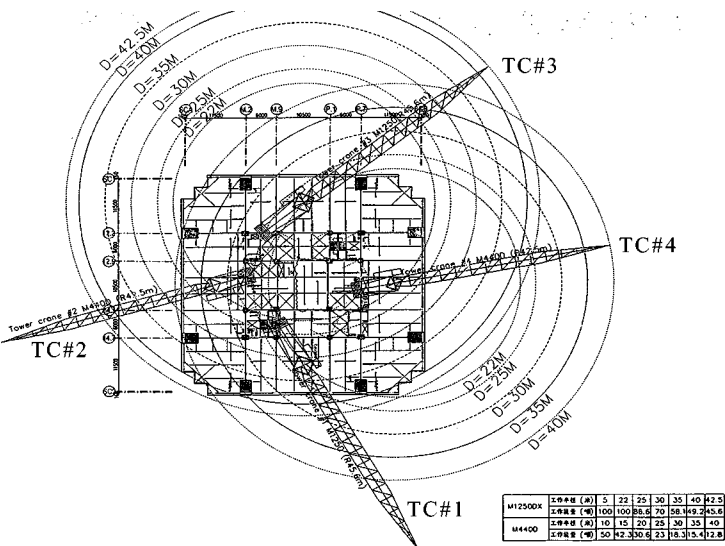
Plan view of the locations of the four tower cranes at the TFC construction site.
